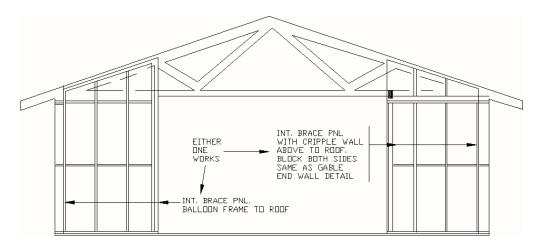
Wall parallel to truss alternate bracing detail.
